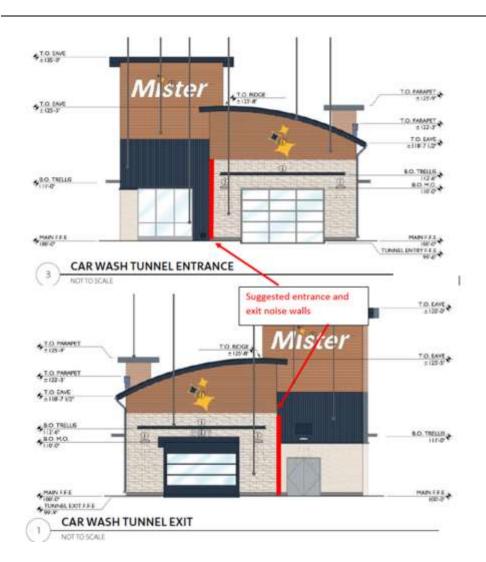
SUGGESTED WALL LOCATIONS
